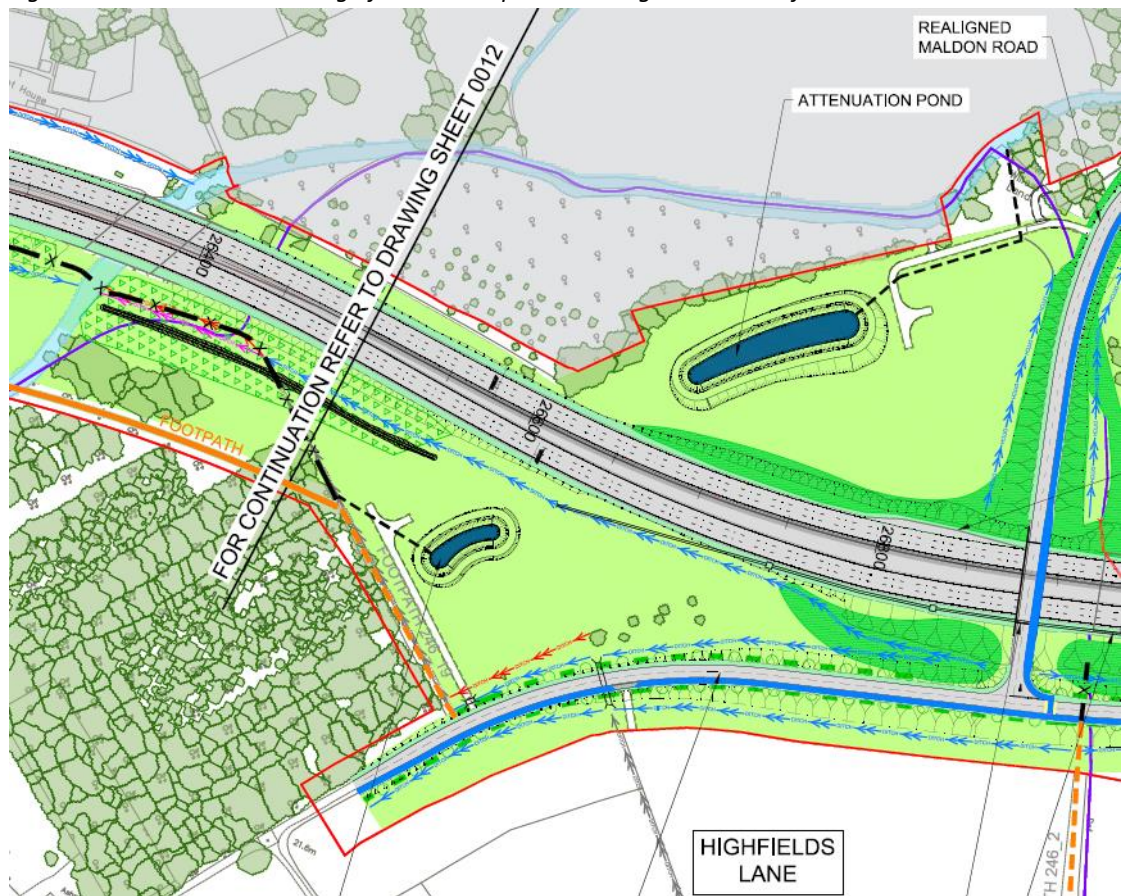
Section 10 – New southern arm linking to Little Braxted Lane
